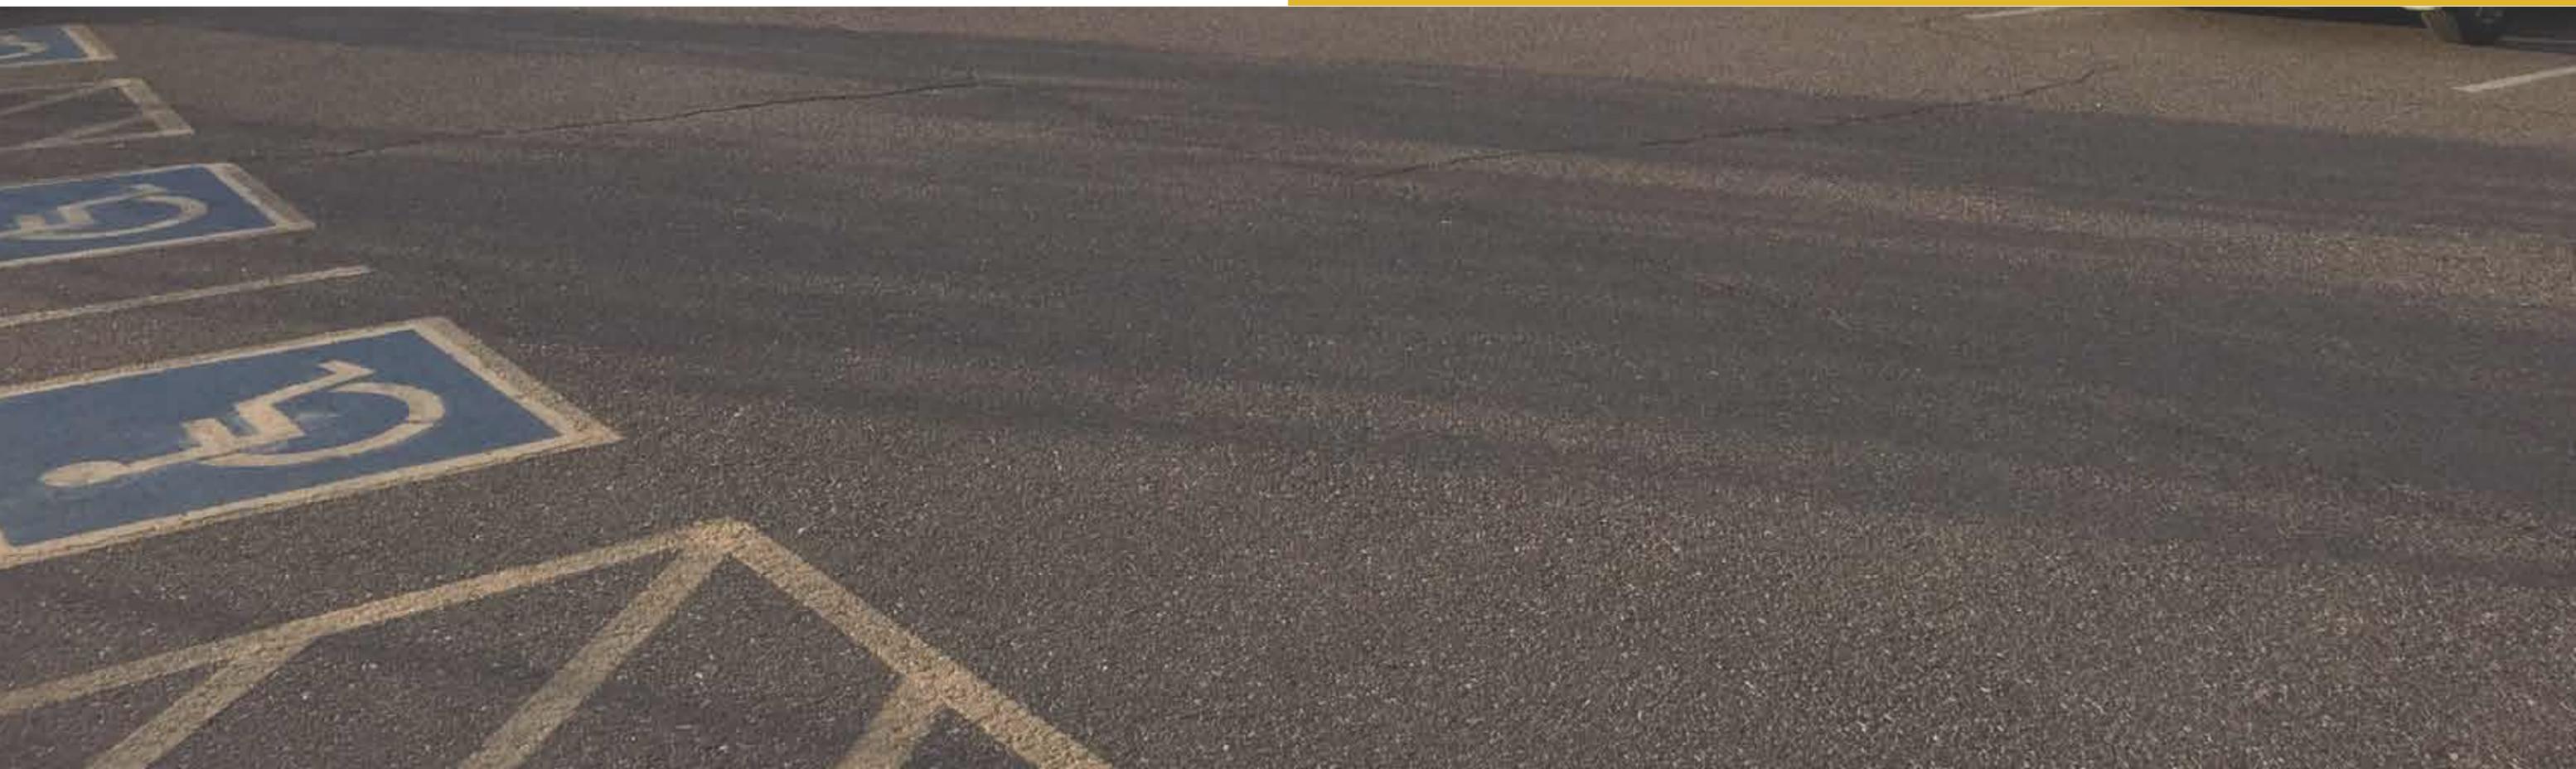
Apache parking area overview. View to west. Photograph taken on November 18, 2014.
